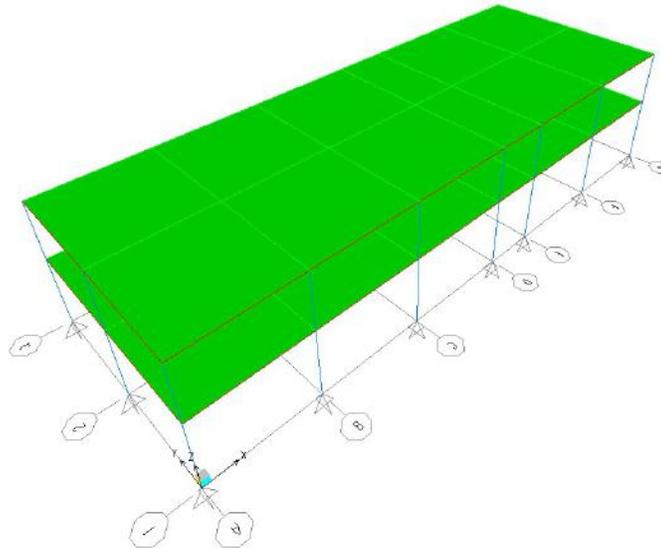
A 3-D numerical model of a retrofitted building with RC column jacketing (RS1).
